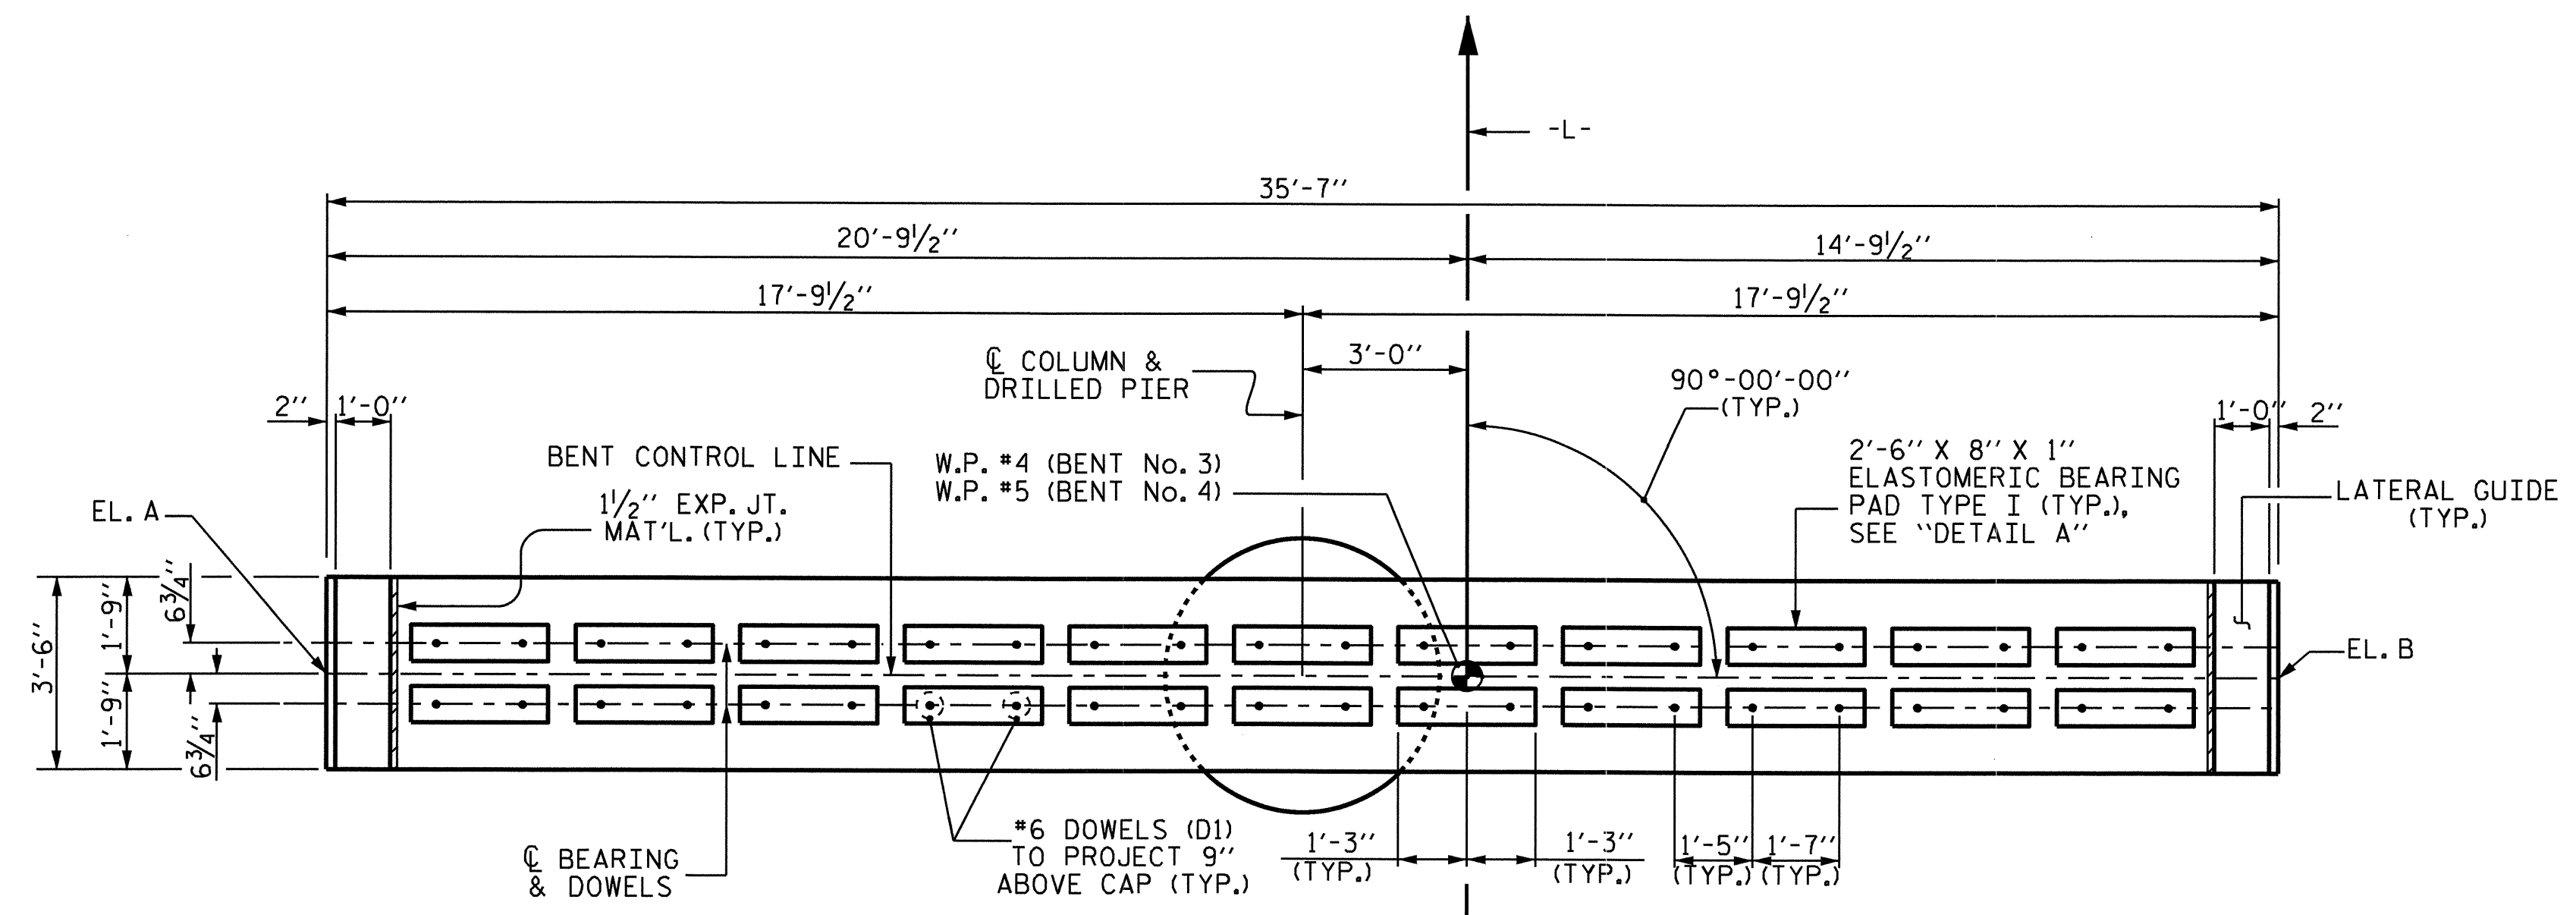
DETAILED DRAWINGS FOR FALSEWORK AND FORMS FOR THIS HAMMERHEAD BENT SHALL BE SUBMITTED. SEE SHEET SN.
